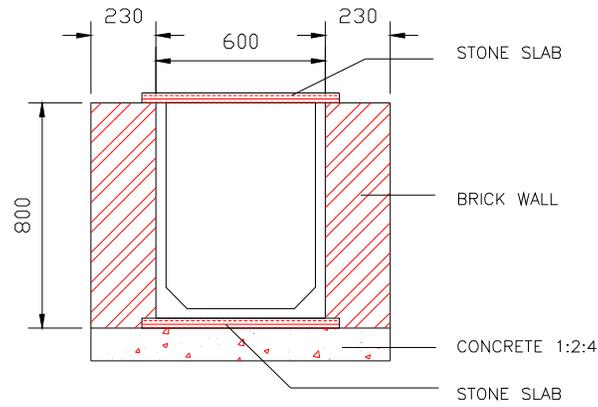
Cross-section of pipe at the Dilwara Bagh House, Gurgaon
